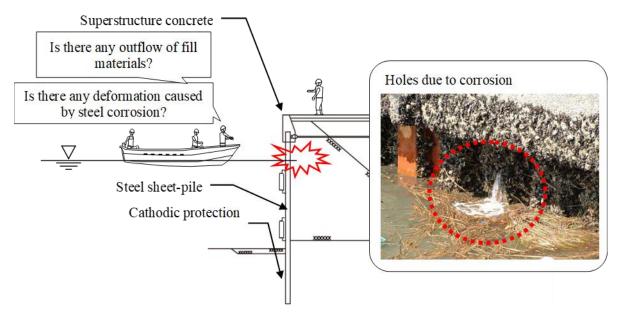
Diagram of inspection of steel sheet piles
